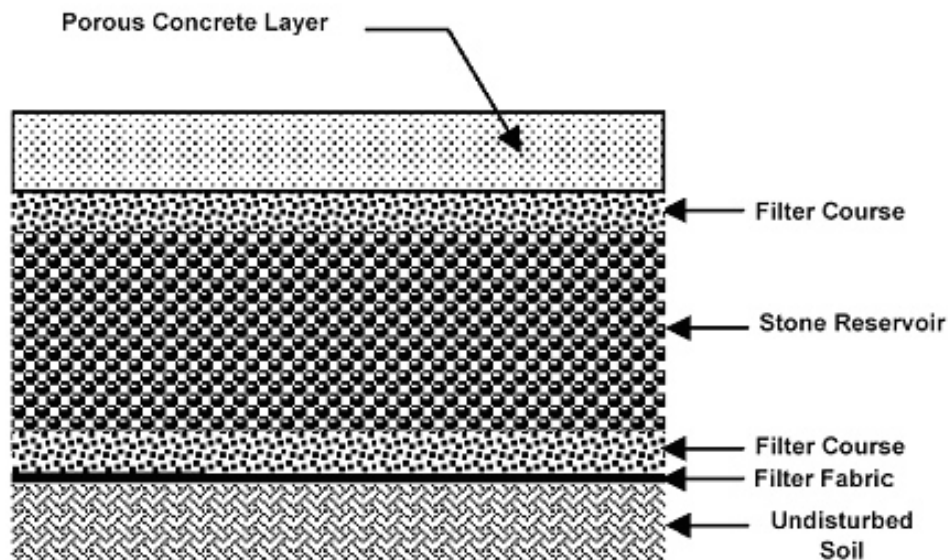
Porous pavement detail (Source: GSWM, 2001)
